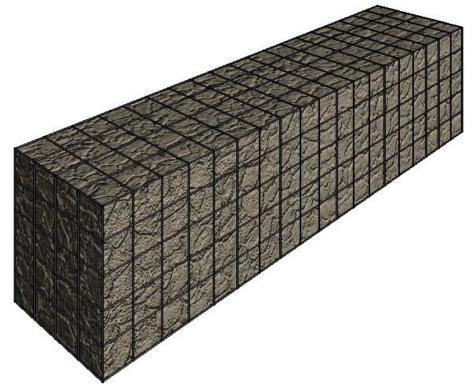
Example of a 3D model for a gabions wall built in REVIT.
